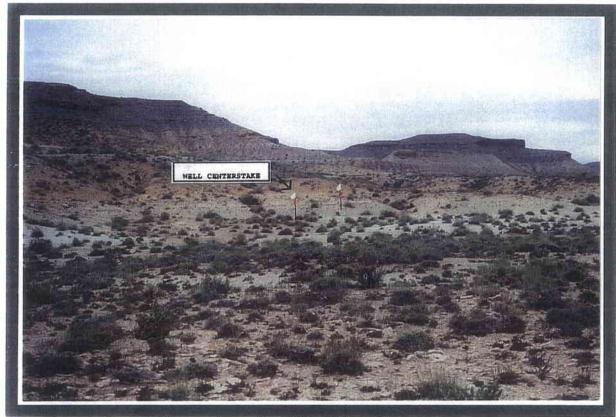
Oblique view of colluvial sediments on and surrounding the proposed Little Canyon Unit #3-9H centerstake and well pad.
